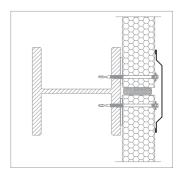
Ob-35 flashing "Panel joint masking strip"
